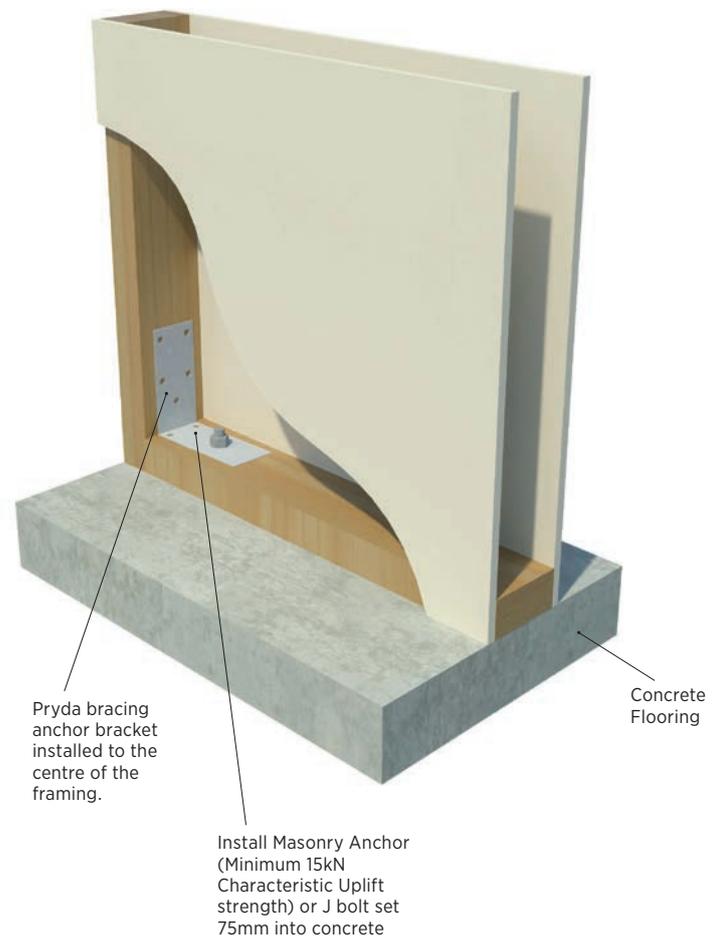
INTERNAL WALL ON CONCRETE FLOOR
